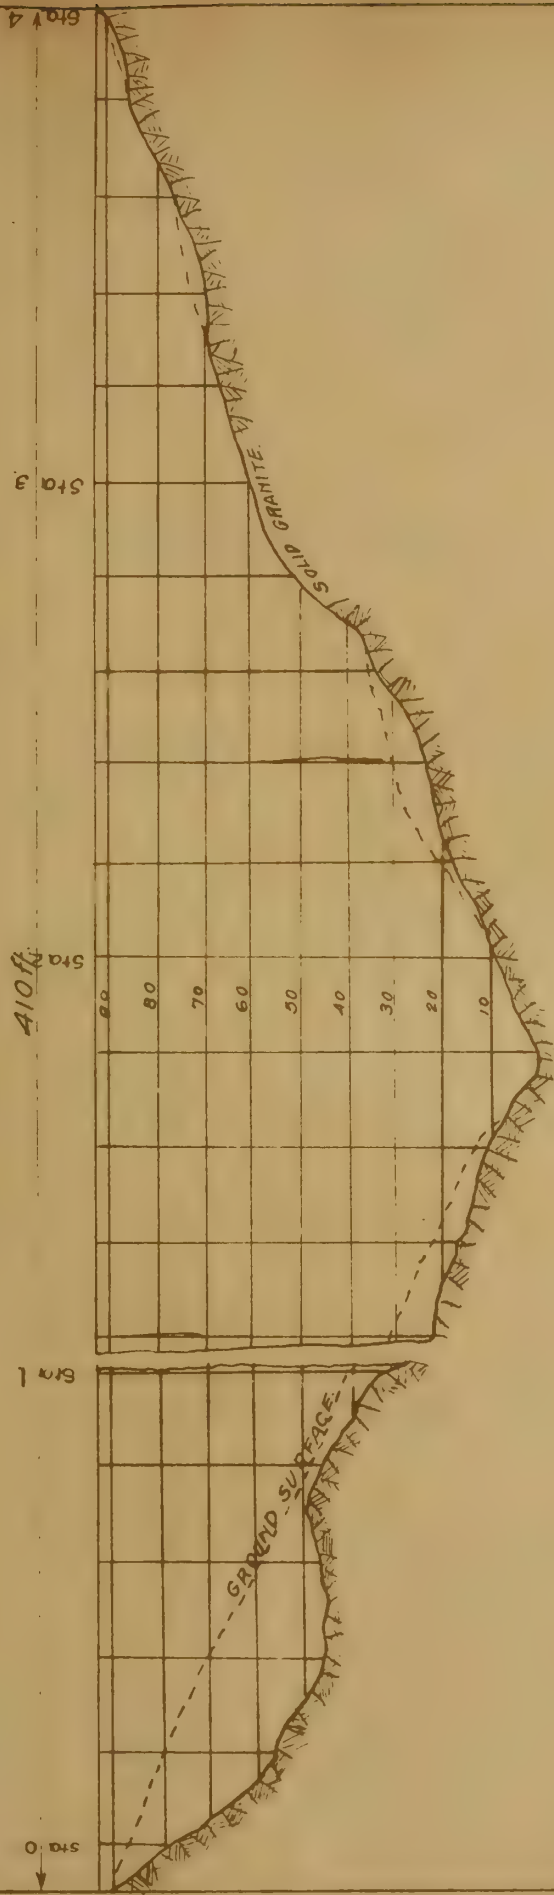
PLATE II ELEVATION OF GRANITE SPRINGS DAM.
